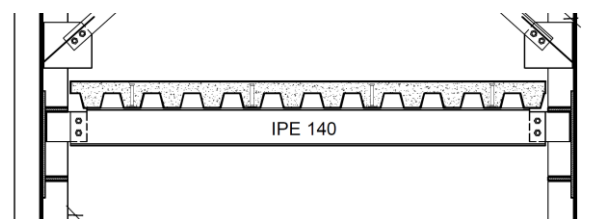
Tested structure: detail of the connection between the deck and the secondary beams
